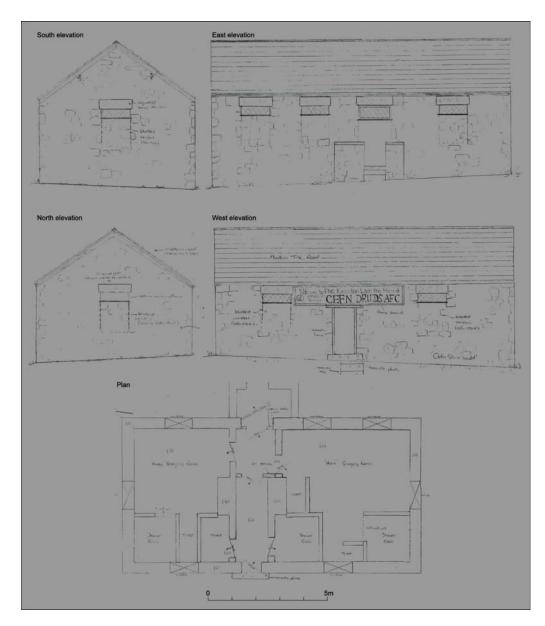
'Cefn Druids' 19th-century building. Elevations and ground plan produced as part of the Building Survey.
